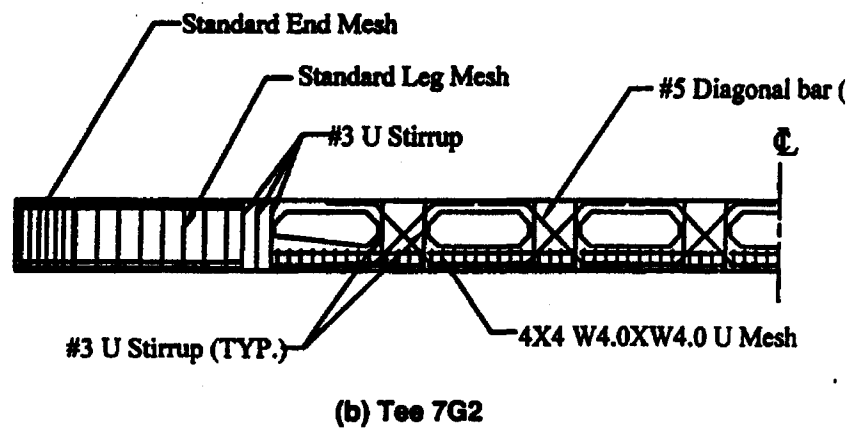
Reinforcement Details in Tested Members (Savage et al. 1996)
